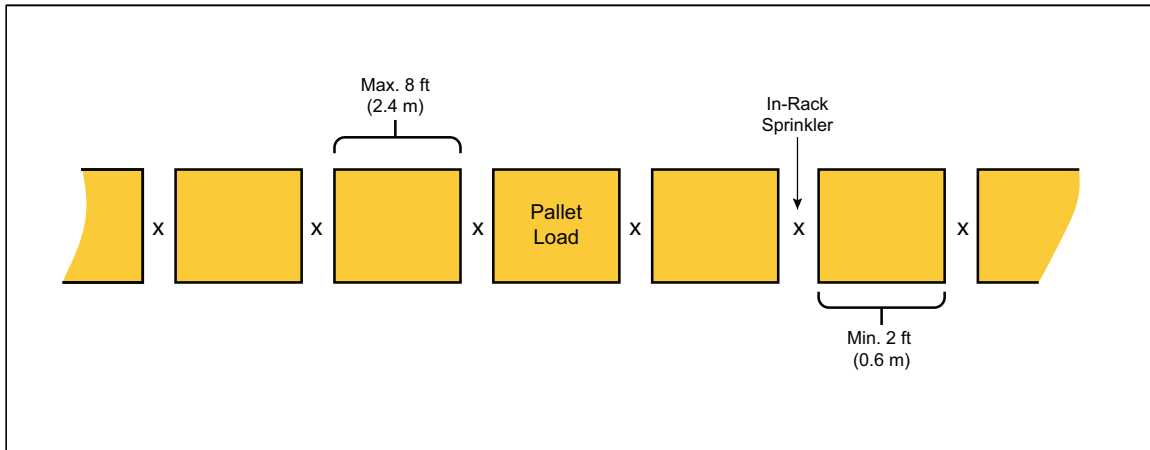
Plan view of IRAS(E) horizontal in-rack sprinkler arrangement for single-row racks
